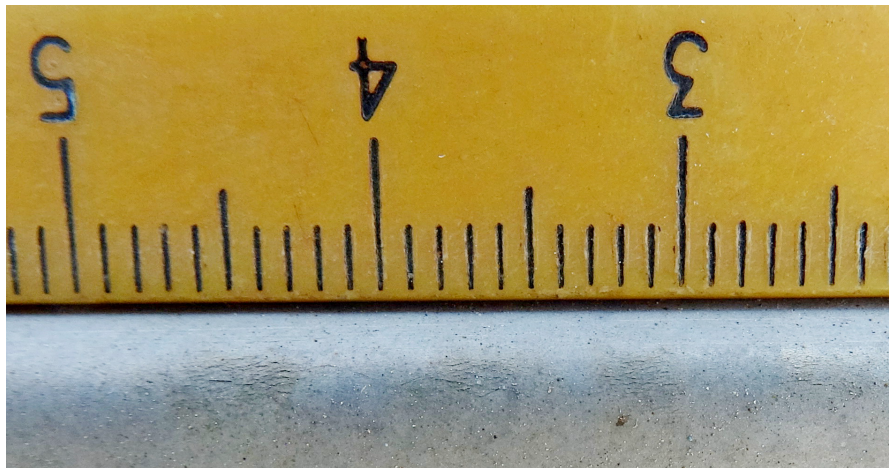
Denver roof profile rib radius showing microcracks; roof in service 44 years (scale in mm).
